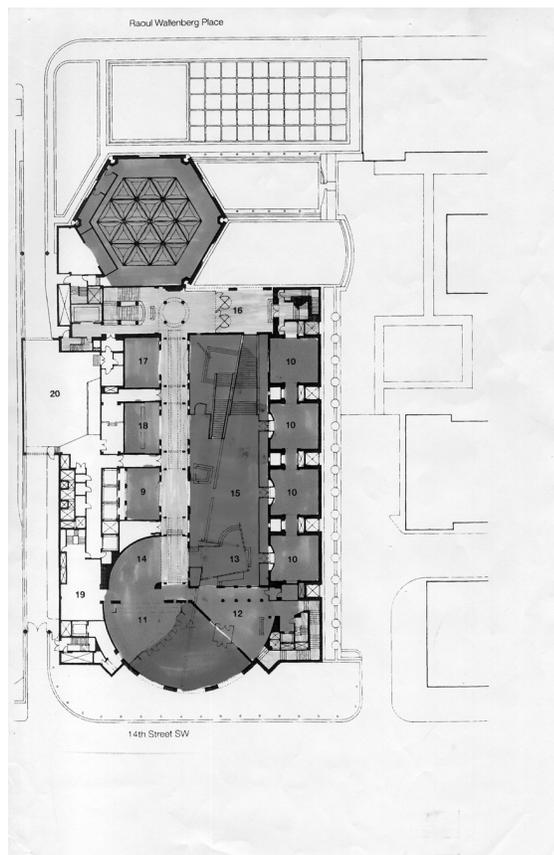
U.S. Holocaust Museum, Ground Floor Plan
